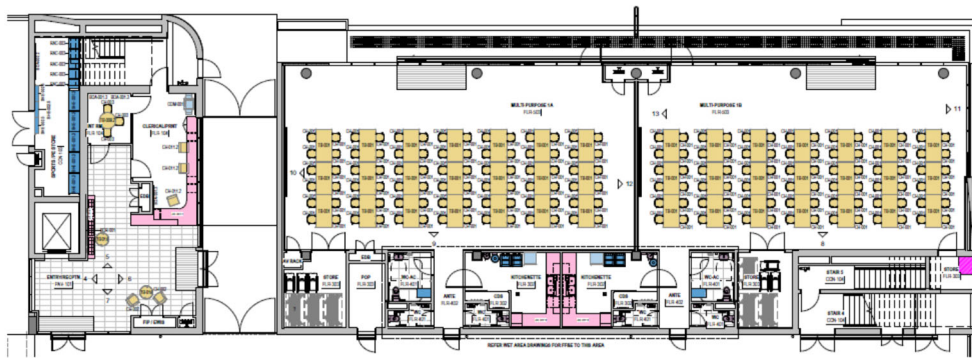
Seating plan for Multi-Purpose Spaces 1A and 1B
